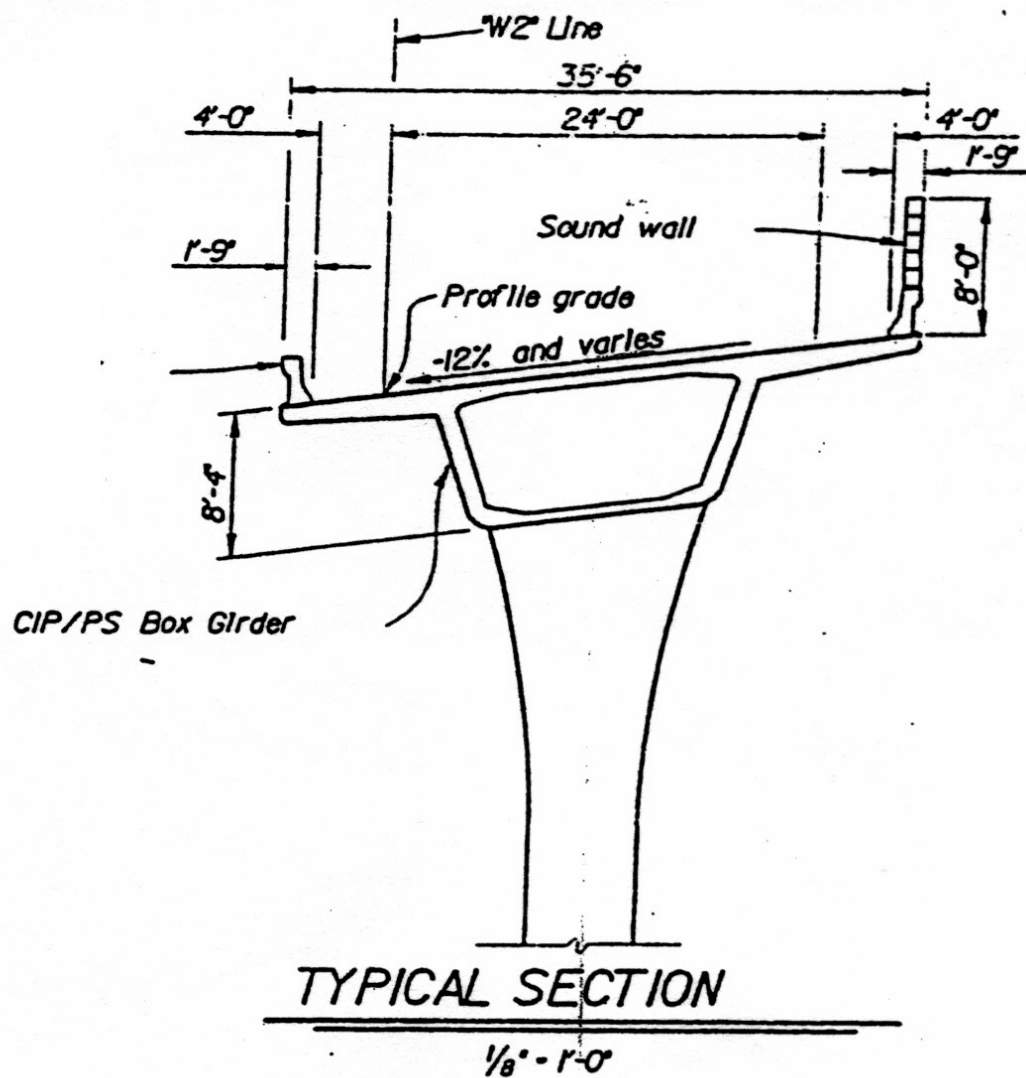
Typical Cross Section of a Box-Girder at West Street On-Ramp
